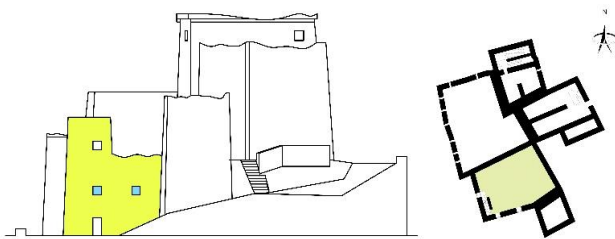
Floor plan and south oriented facade of Thee Ain Village building. Source: The author
